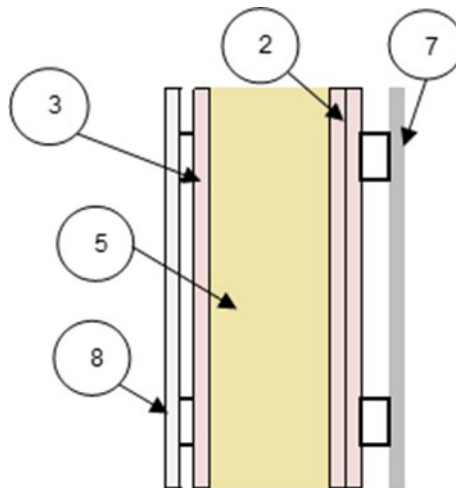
Massive timber wall system with non-fire grade lining and cladding – Section view
